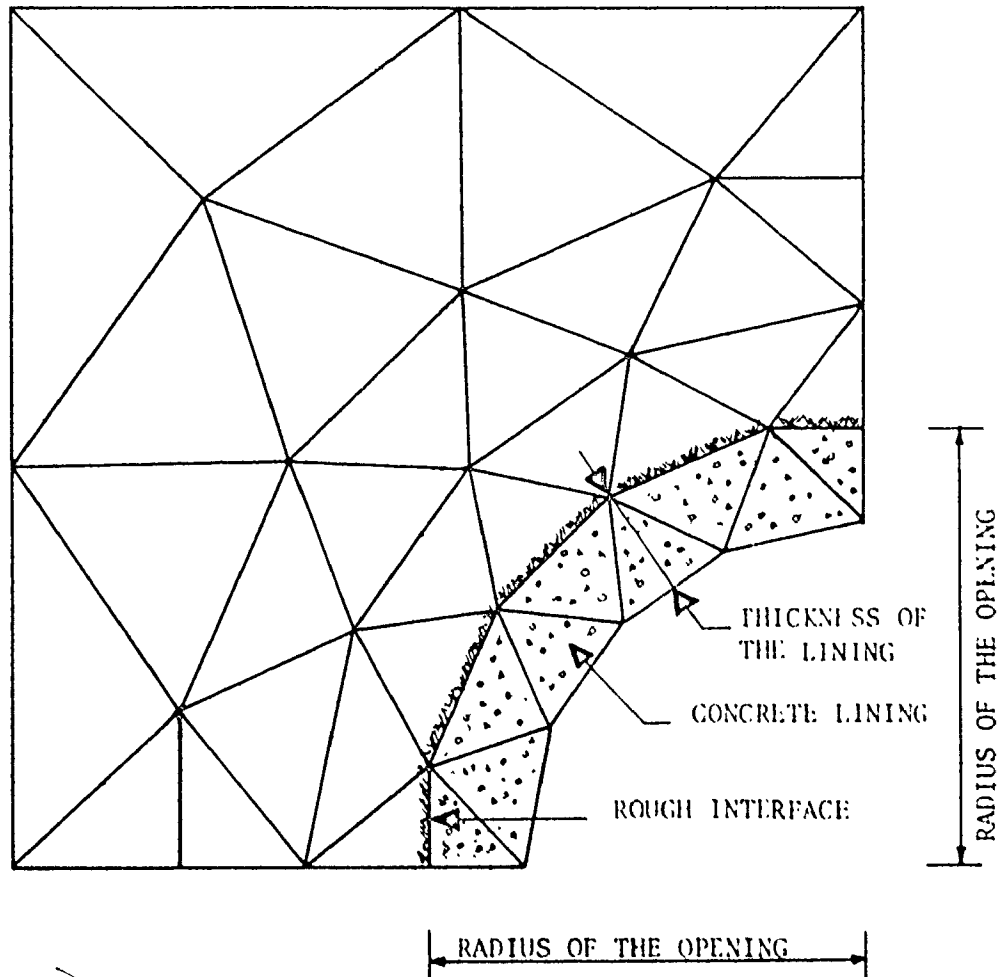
CONCRETE LINING WITHOUT JOINT ELEMENTS
